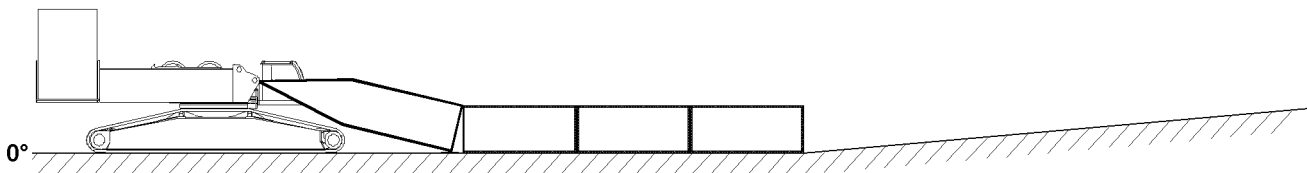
Disassembling and removing the boom - intermediate sections with the end section
